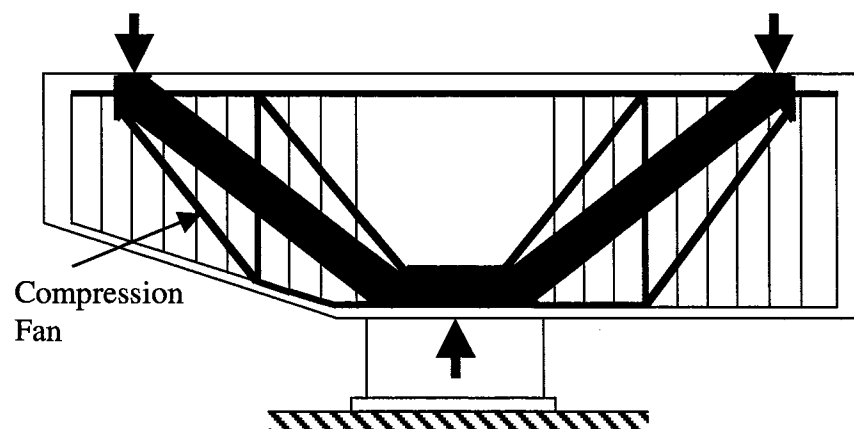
Bent Cap Truss Model with Few Active Stirrups.
